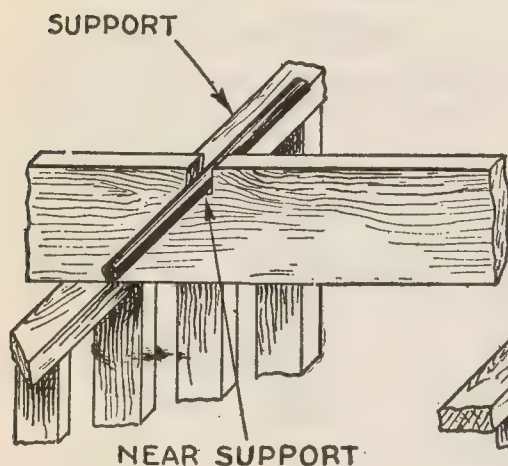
,010 and 9,011.—Right and wrong way to cut joists in installing horizontal piping.
